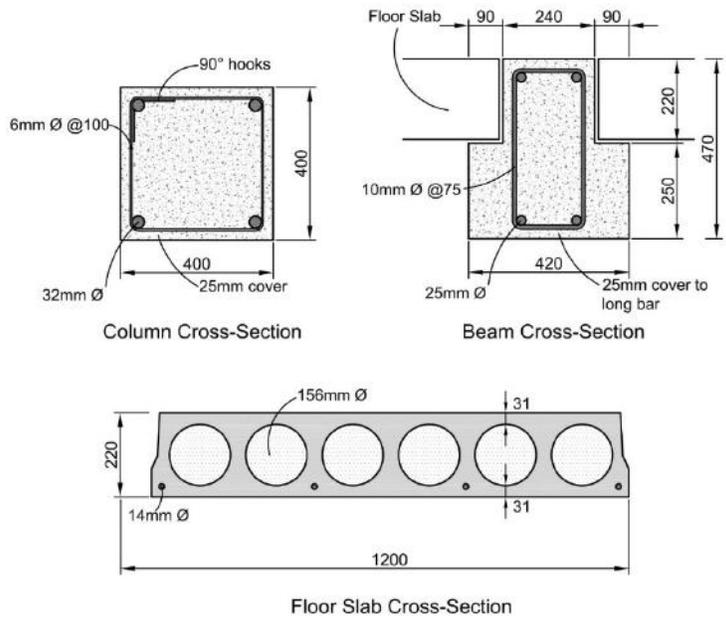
Cross-sectional dimensions and reinforcement for columns, beams, and slabs.
